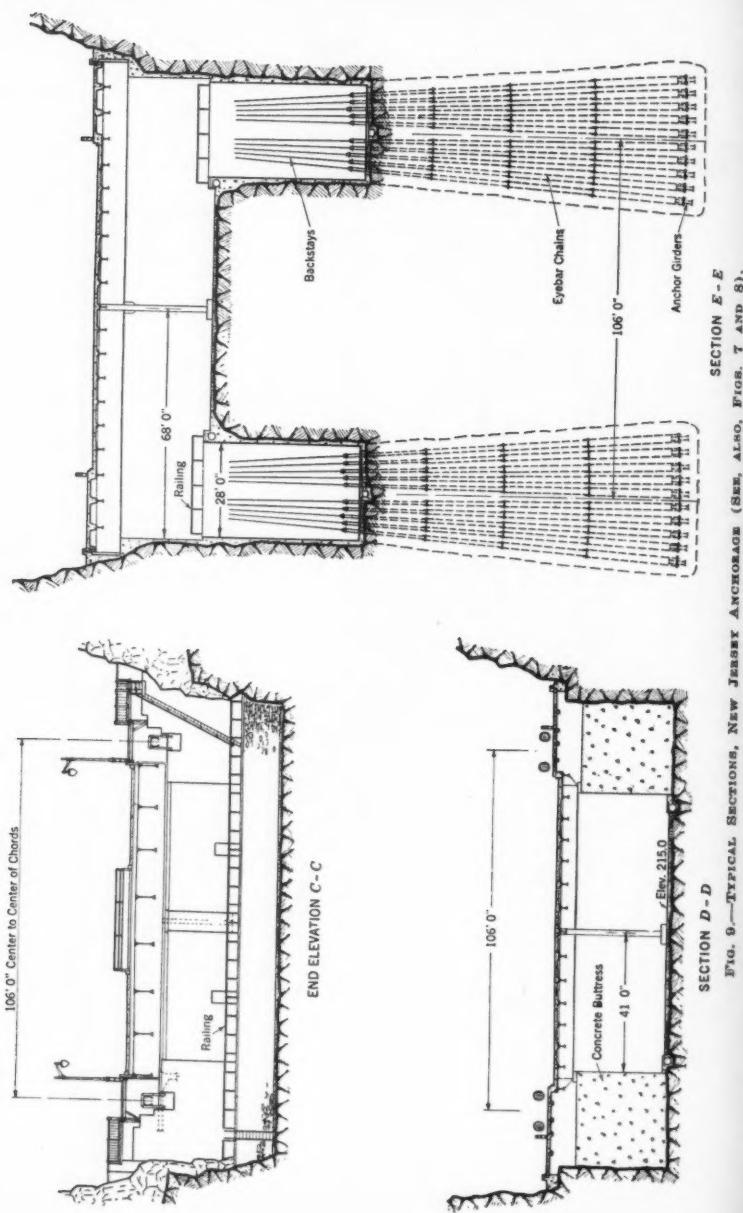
TYPICAL SECTIONS, NEW JERSEY ANCHORAGE (SEE ALSO, FIGS. 7 AND 8).
